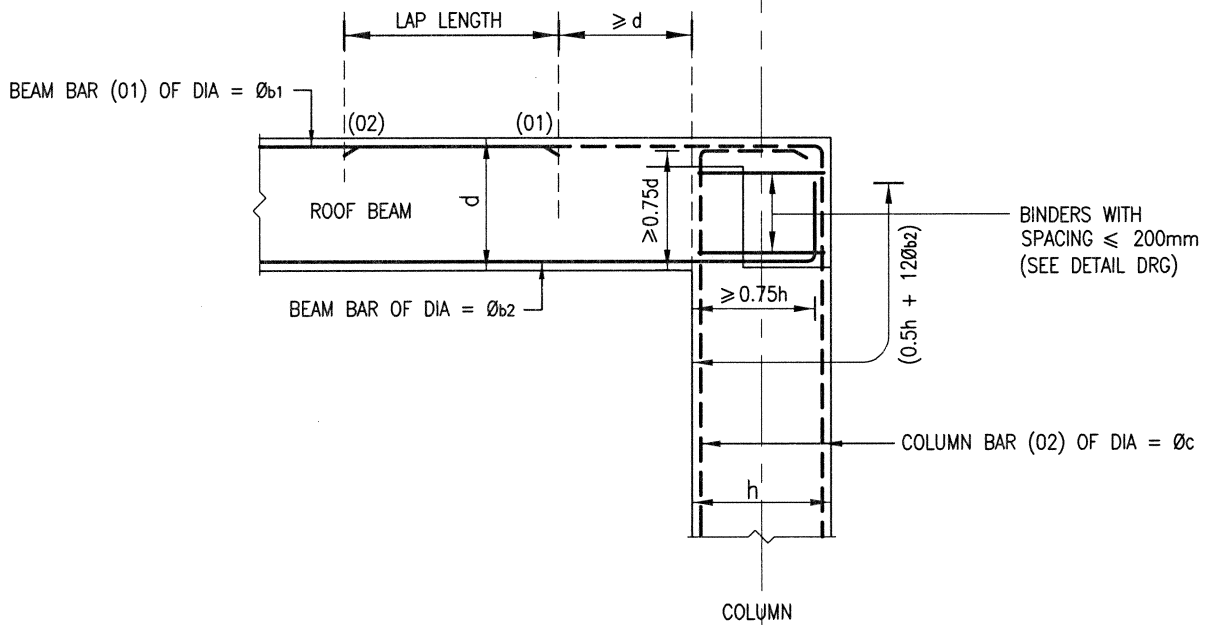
ROOF BEAM & EXTERIOR COLUMN JUNCTION
